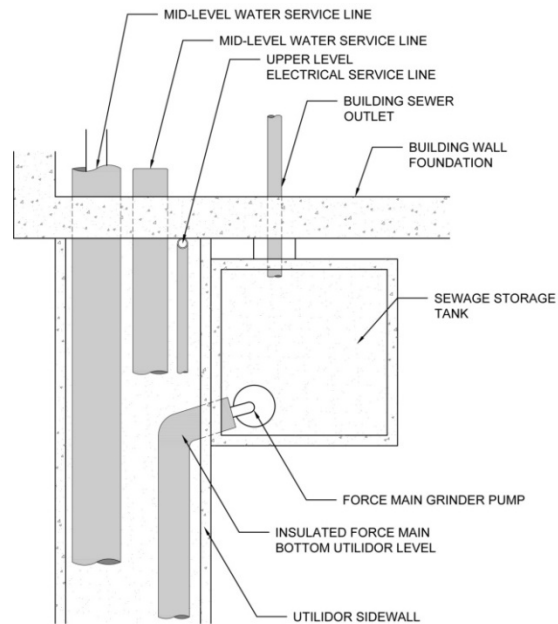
Building connection plan detail. Plan view of the connection of the barrier utilidor to the existing structure.
